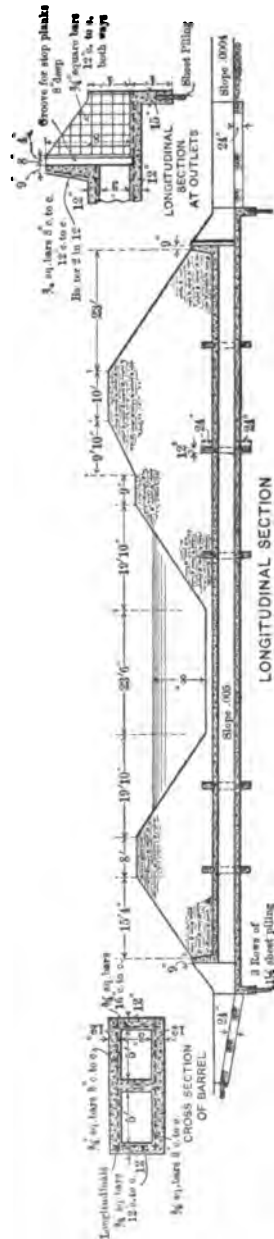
Reinforced Concrete Culvert, War Dance Coulee, Lower Yellowstone Canal, Montana.
